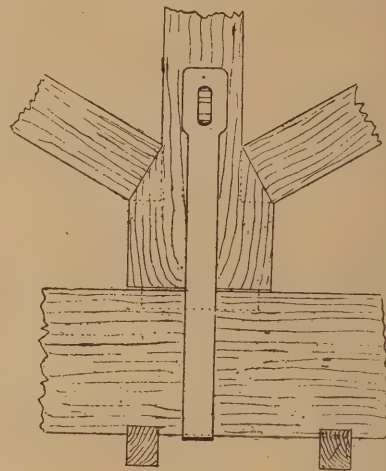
DETAILS OF FOOT OF KING-POST (ELEVATION).
